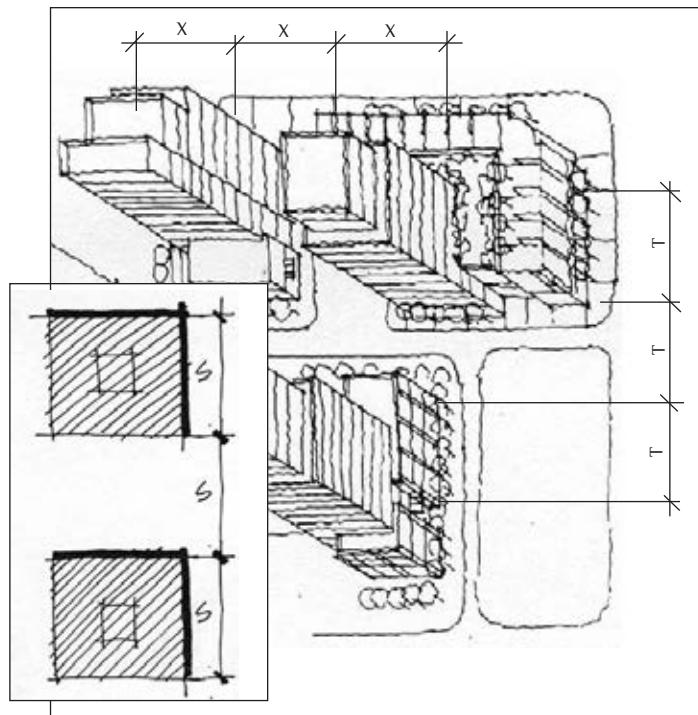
Minimum tower spacing should follow a 1:1:1 relationship between floor plate size and distance between buildings
